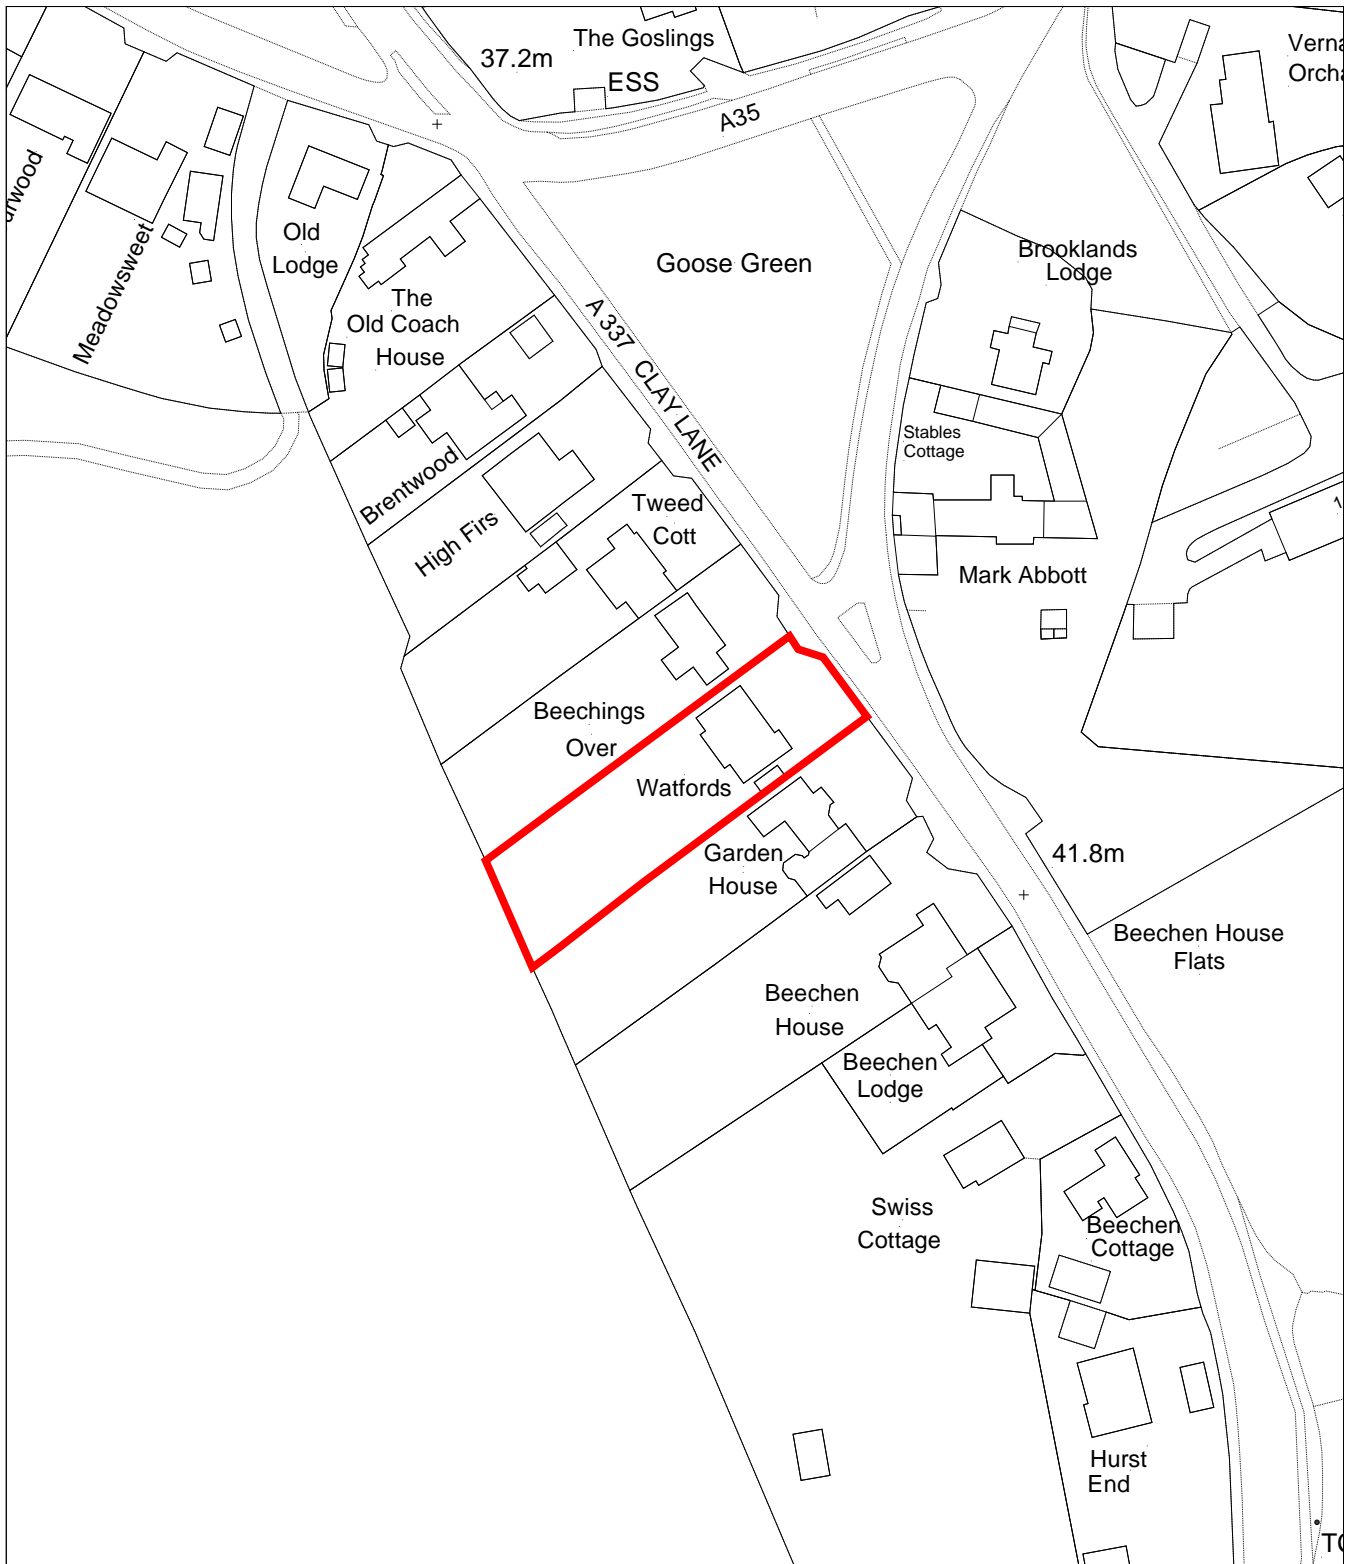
J30 A103A (Proposed Location & Block Plans)
